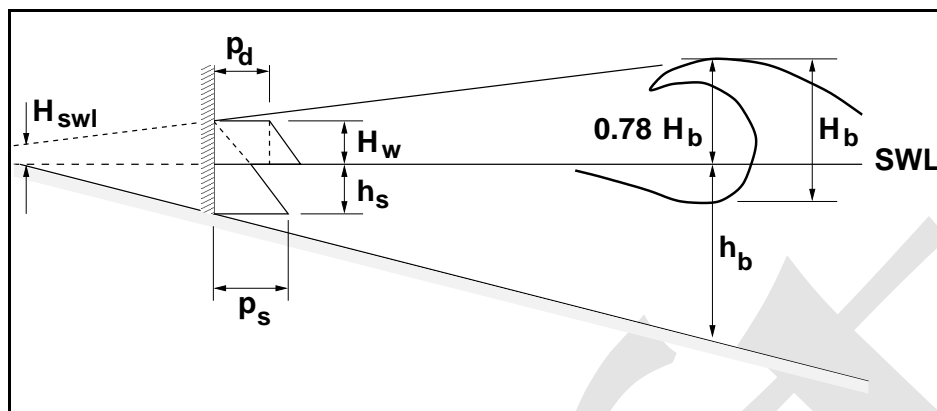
Broken wave forces on wall seaward of shoreline
